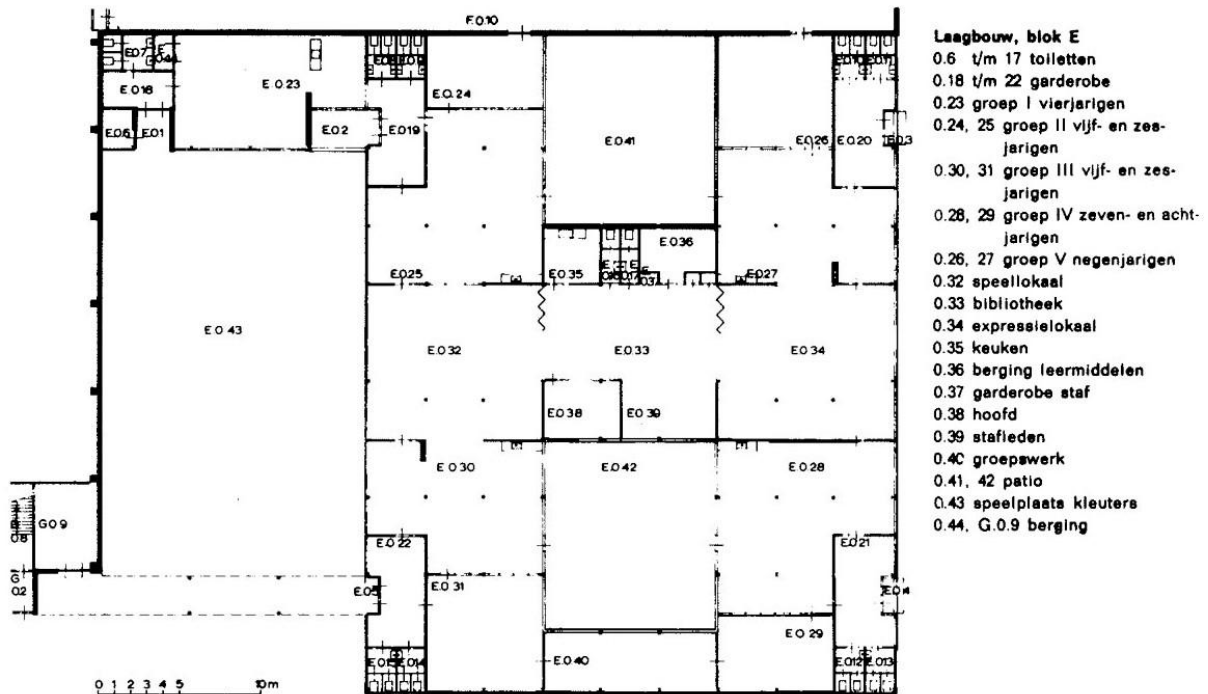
Floor plan building for primary education, 1973. (source: (Van den Bosch et al., 1980, p. 119).
